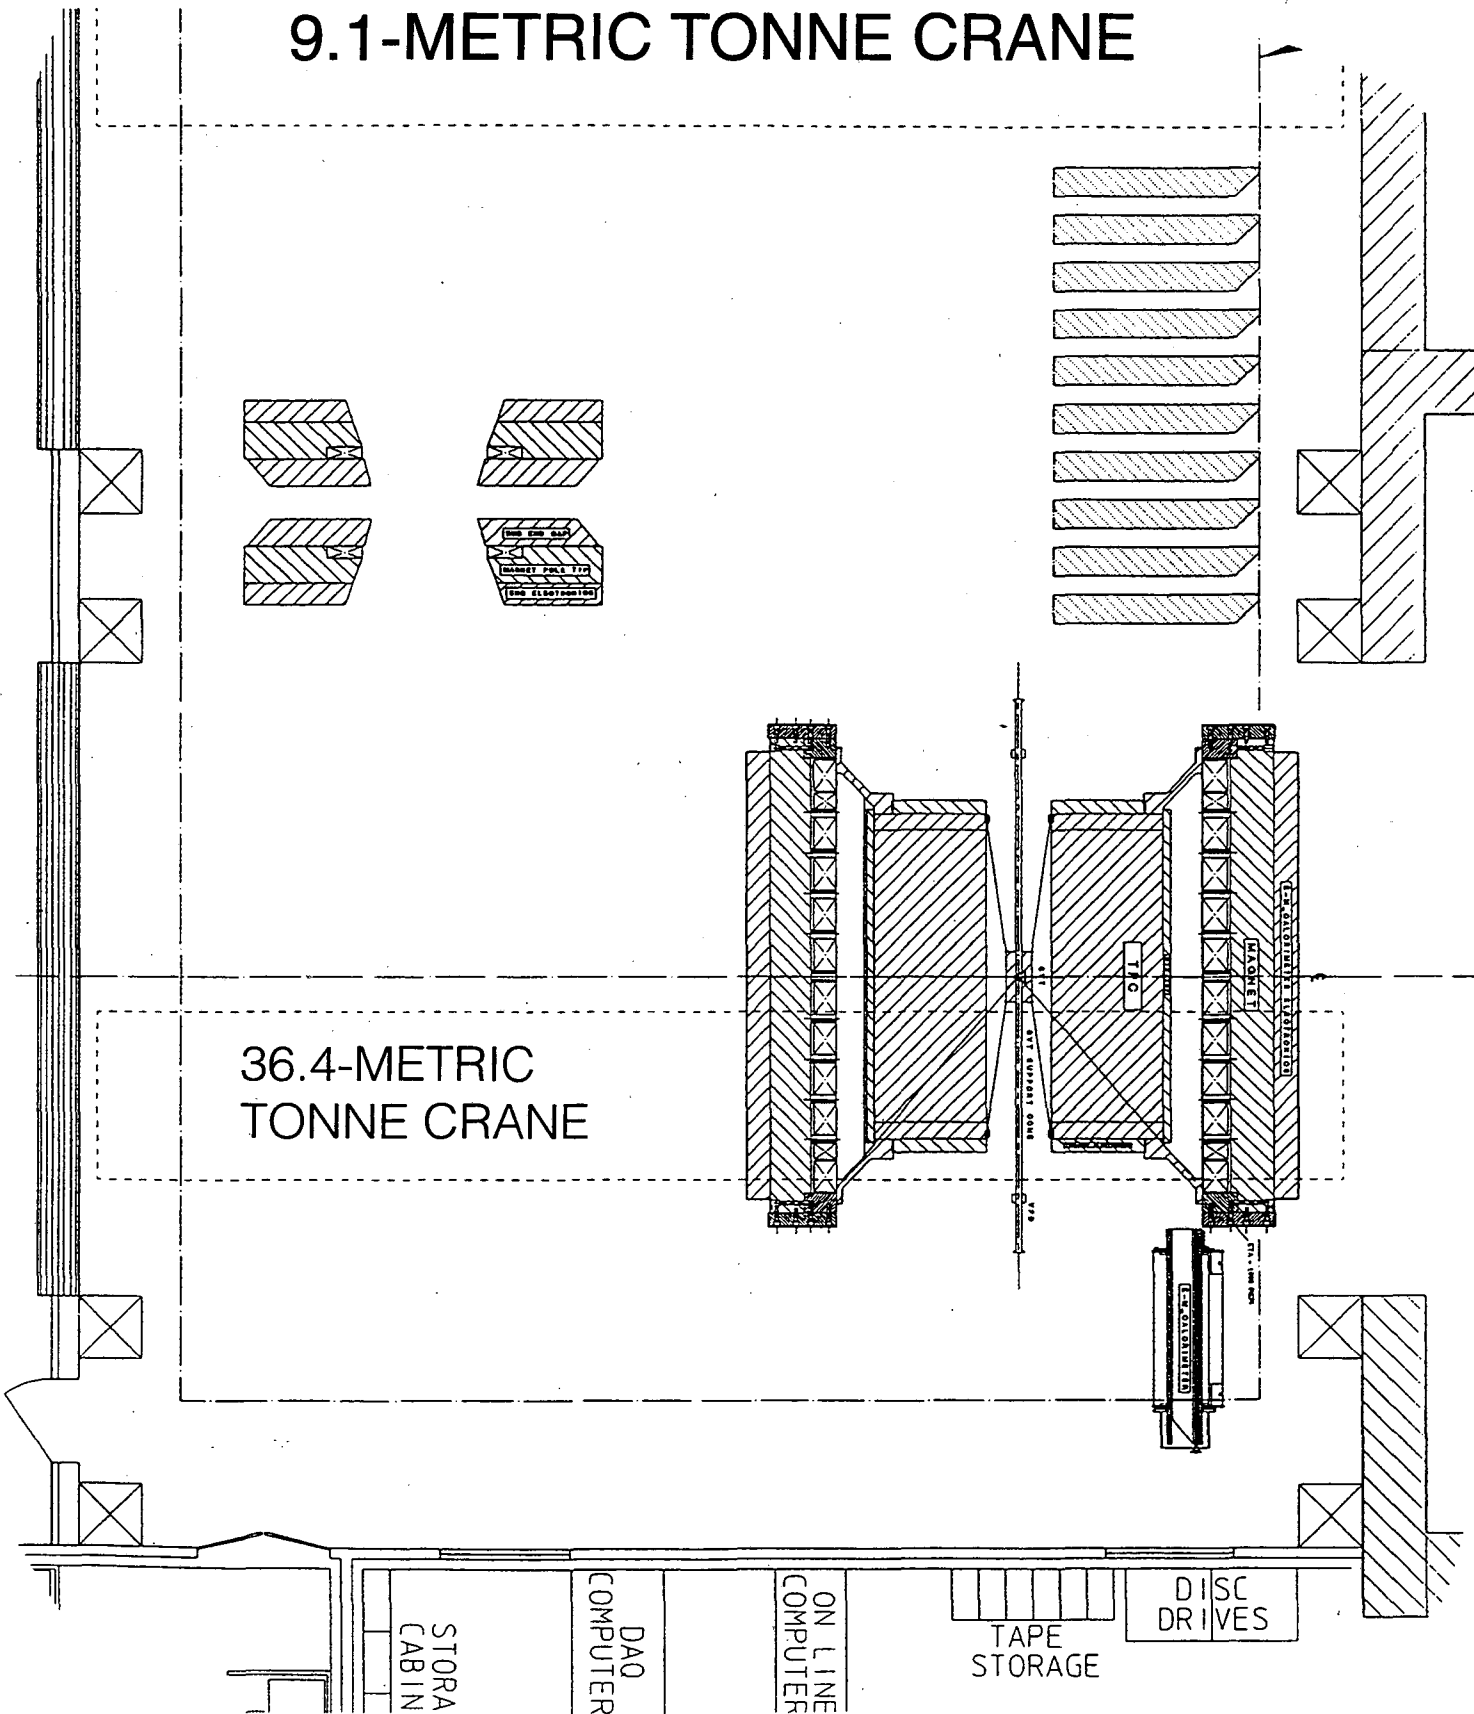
A-7. A plan view showing the installation of modules of the barrel electromagnetic calorimeter in the STAR assembly hall.
